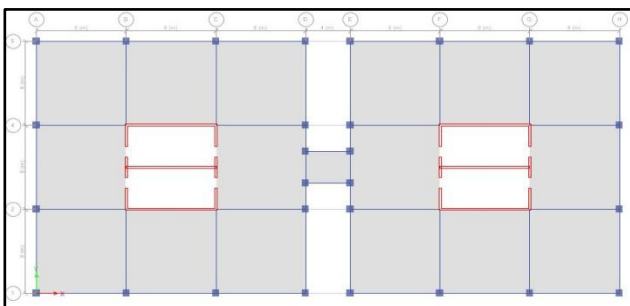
PLAN VIEW OF THE BUILDING WITH 4m SPAN CONNECTING CORRIDOR
